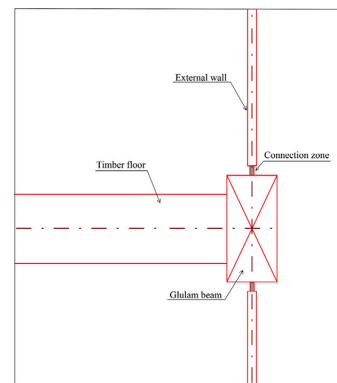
Modeling of the external wall with “connection-zone” shell elements.
